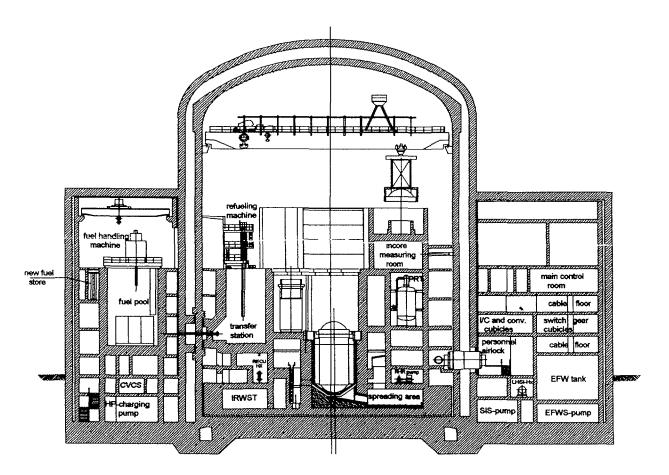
EPR reactor building arrangement — Containment section AA [20].
